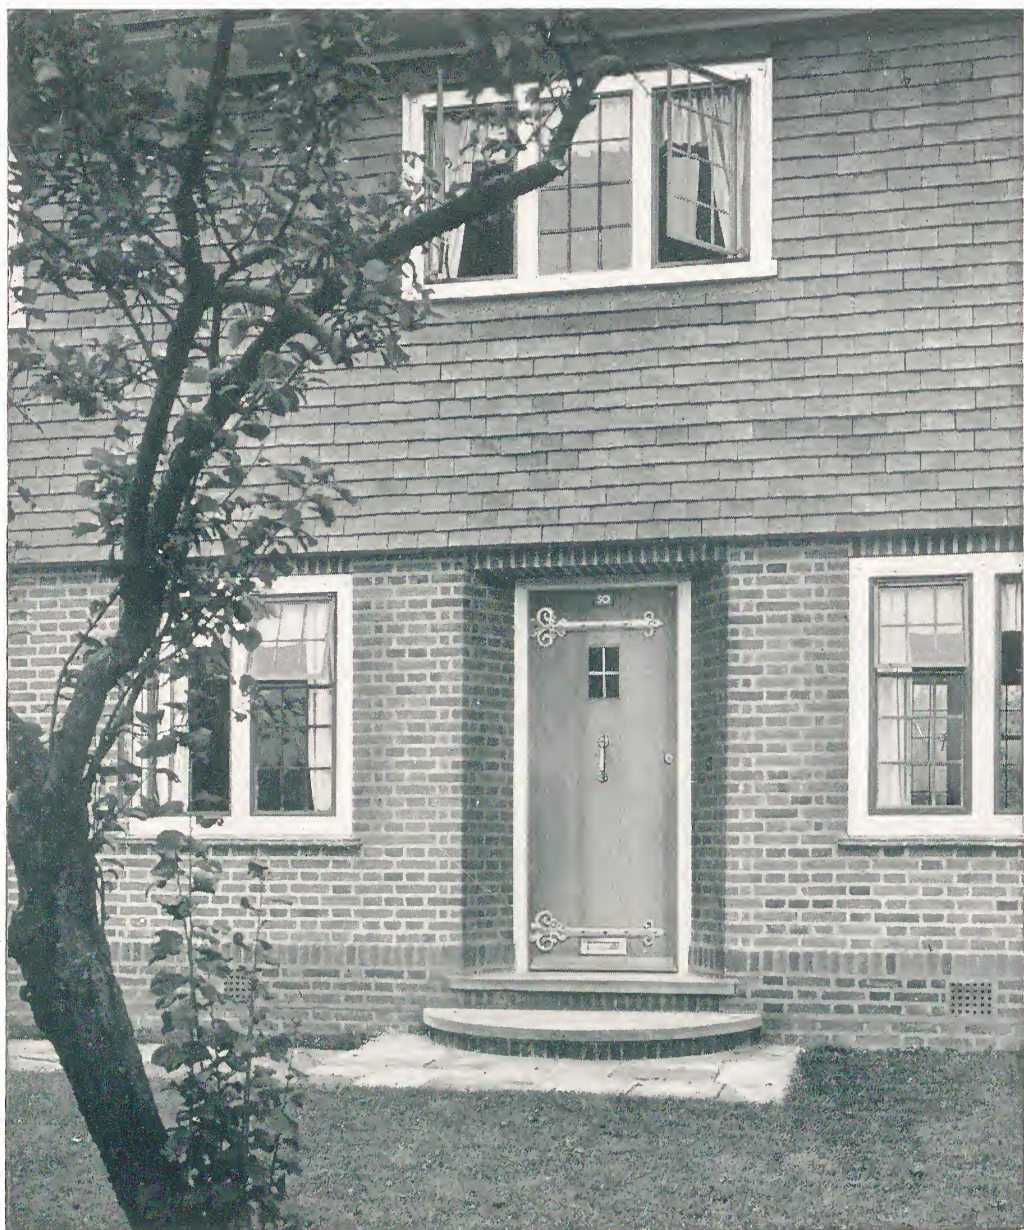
THIN FACING BRICKS WITH THICK FLUSH JOINTS, SPLAYED DOOR JAMBS,
